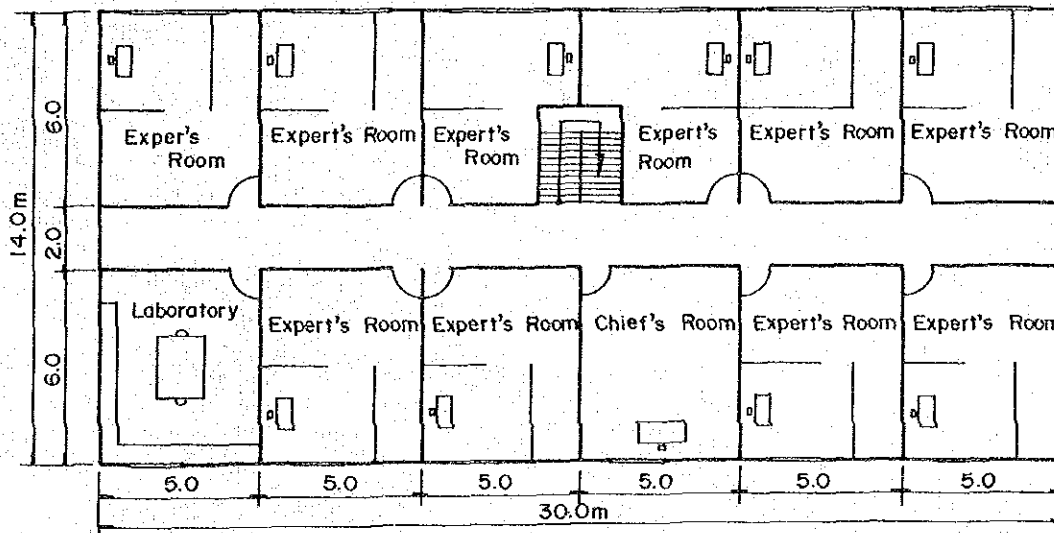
Floor Plan of Agricultural Development Center.
